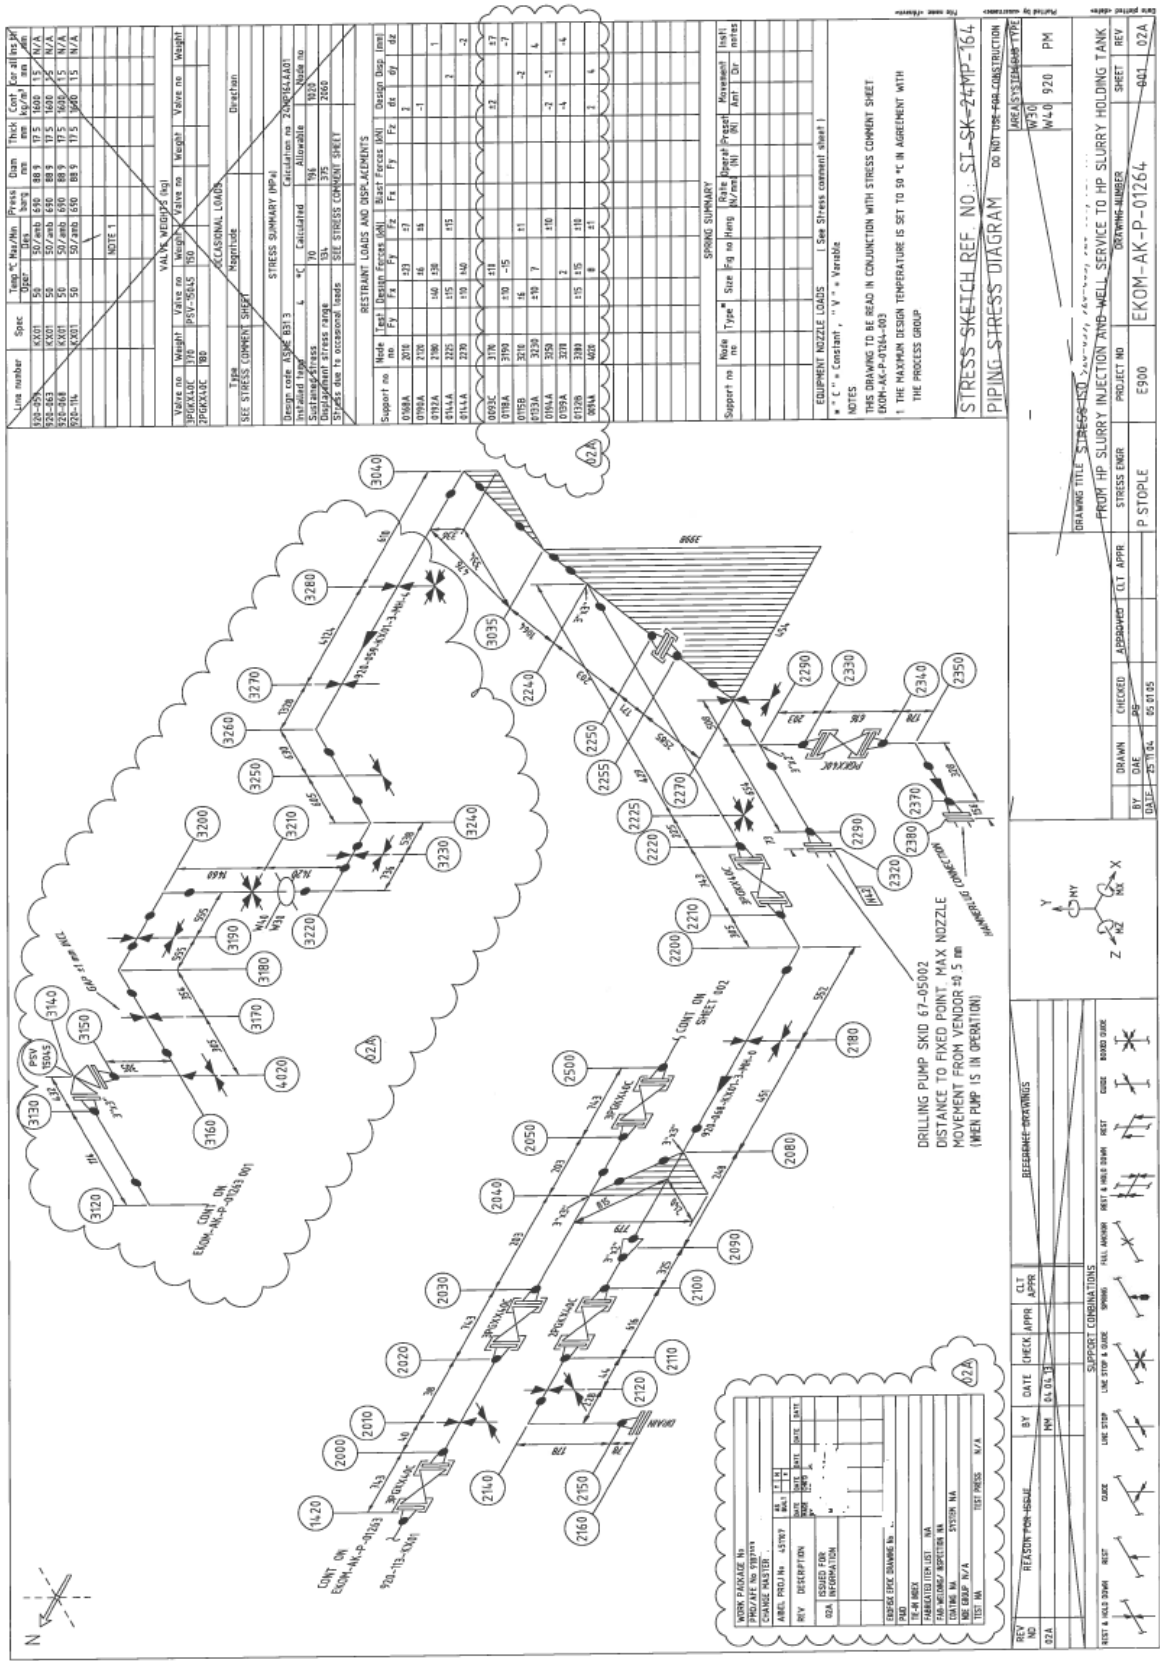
Pipe stress isometric drawing of the Slurry system in Mud Handling system sheet 3 of 6
